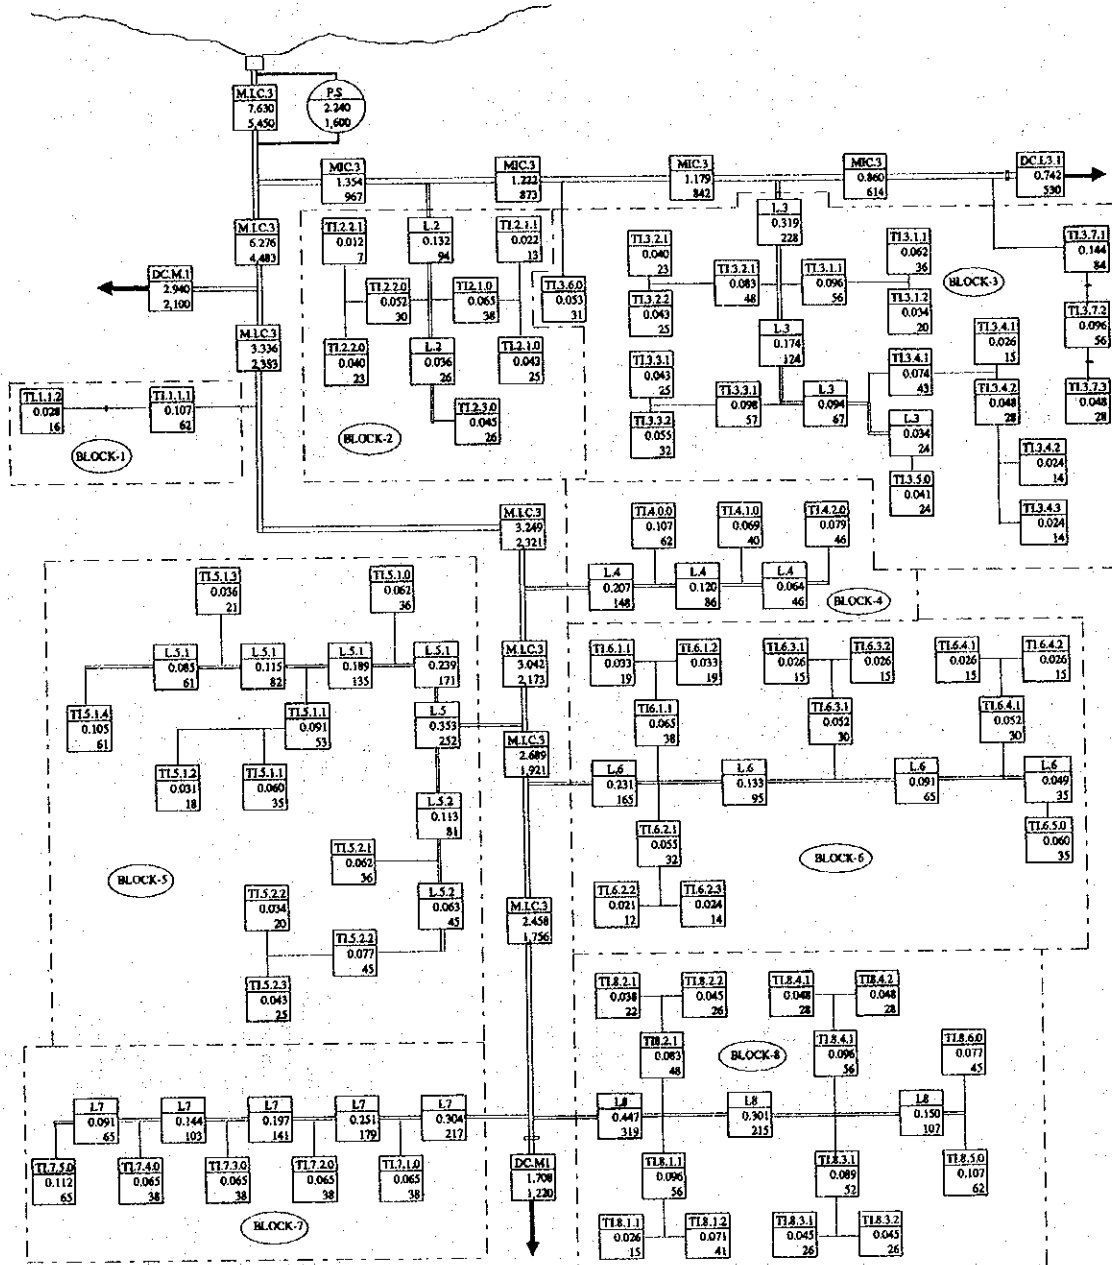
Canal Layout of Tonle Bati Irrigation Project
